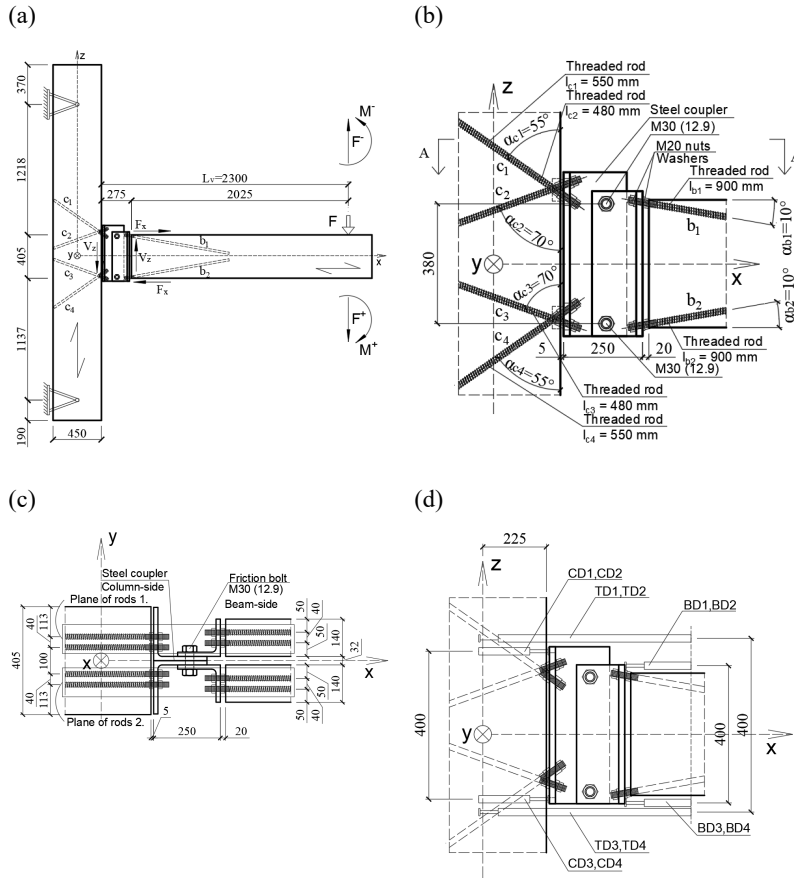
Experimental set-up: (a) beam-to-column moment-resisting connection, (b) technical layout of the connection, (c) section A-A, (d) location of instrumentation
